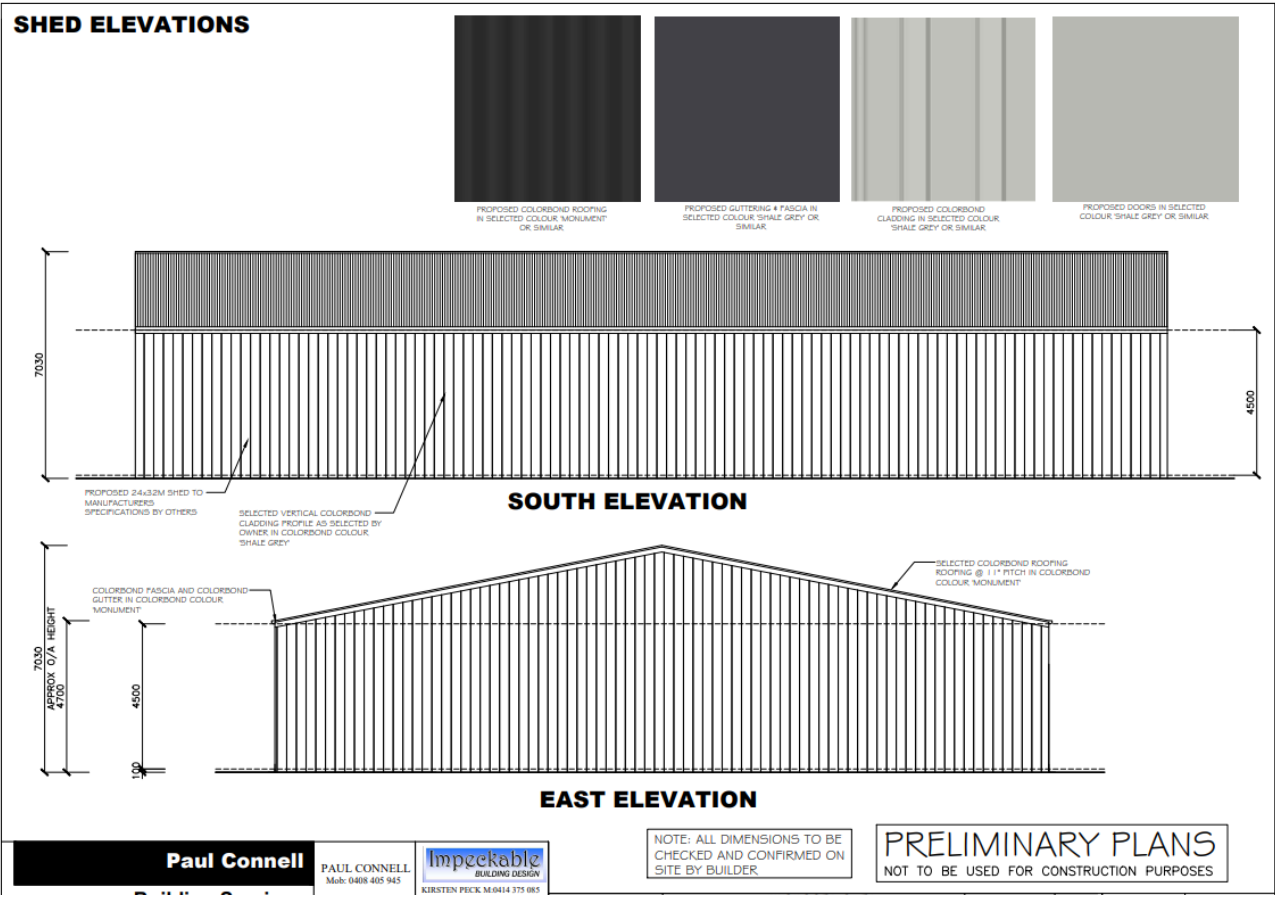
Proposed Store Elevations Plan*Reduction in car parking
